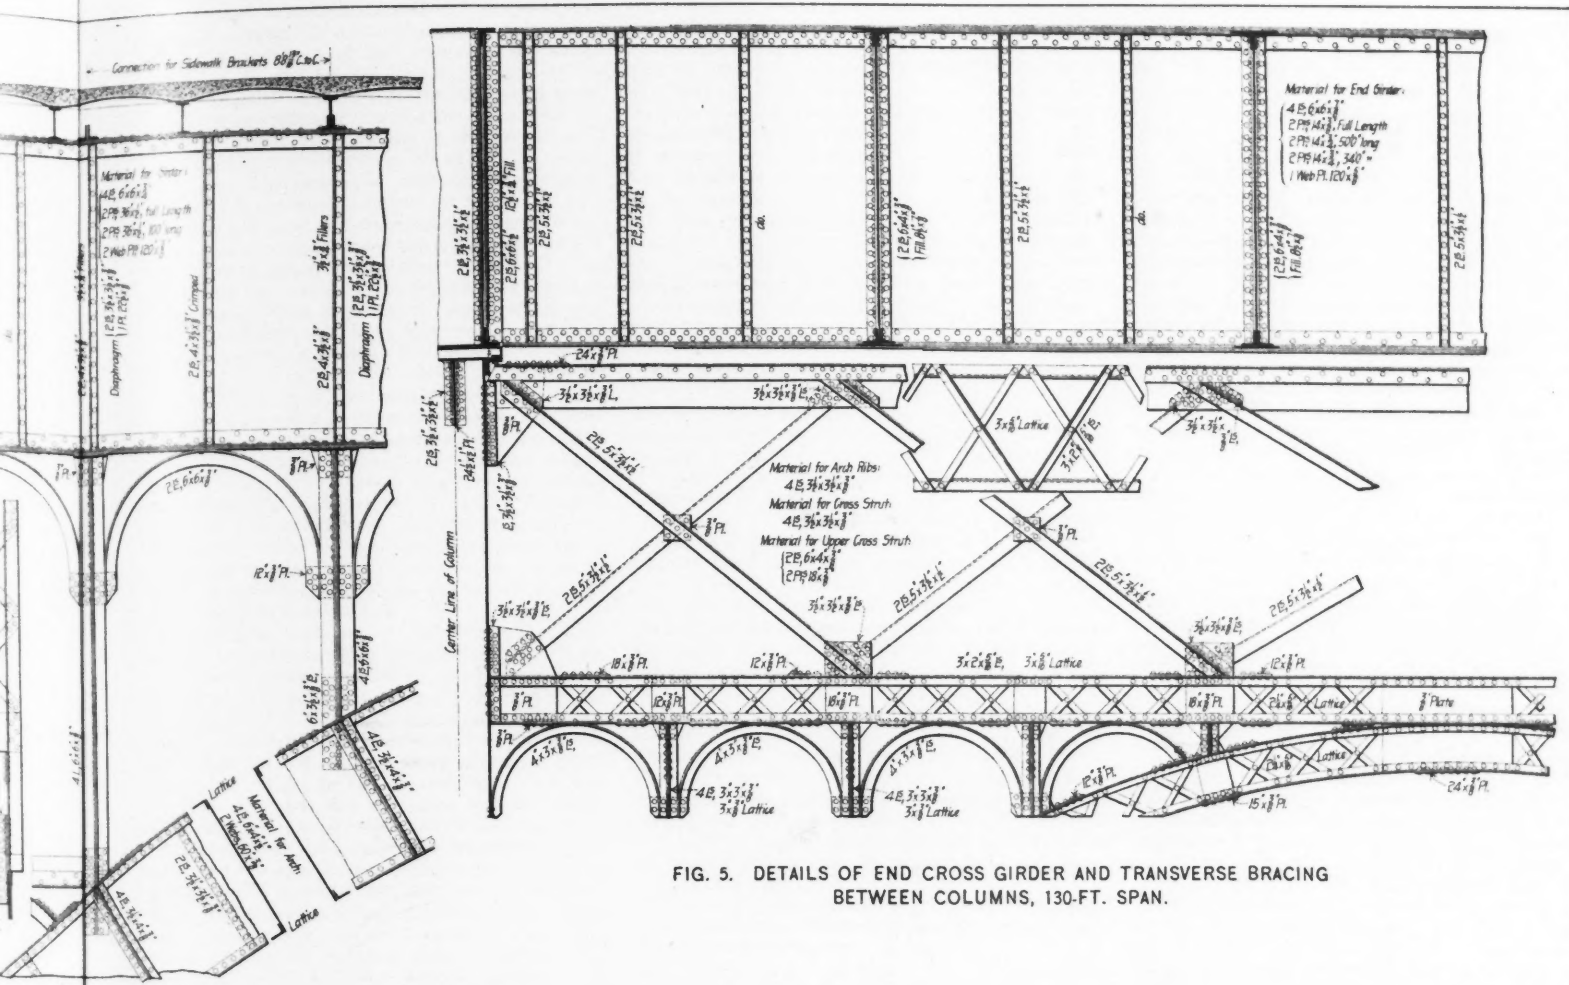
DETAILS OF END CROSS GIRDER AND TRANSVERSE BRACING BETWEEN COLUMNS, 130-FT. SPAN.
